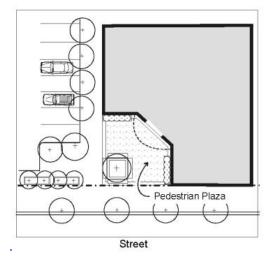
(C)(4): Example of a pedestrian plaza connection between the street and the building.
